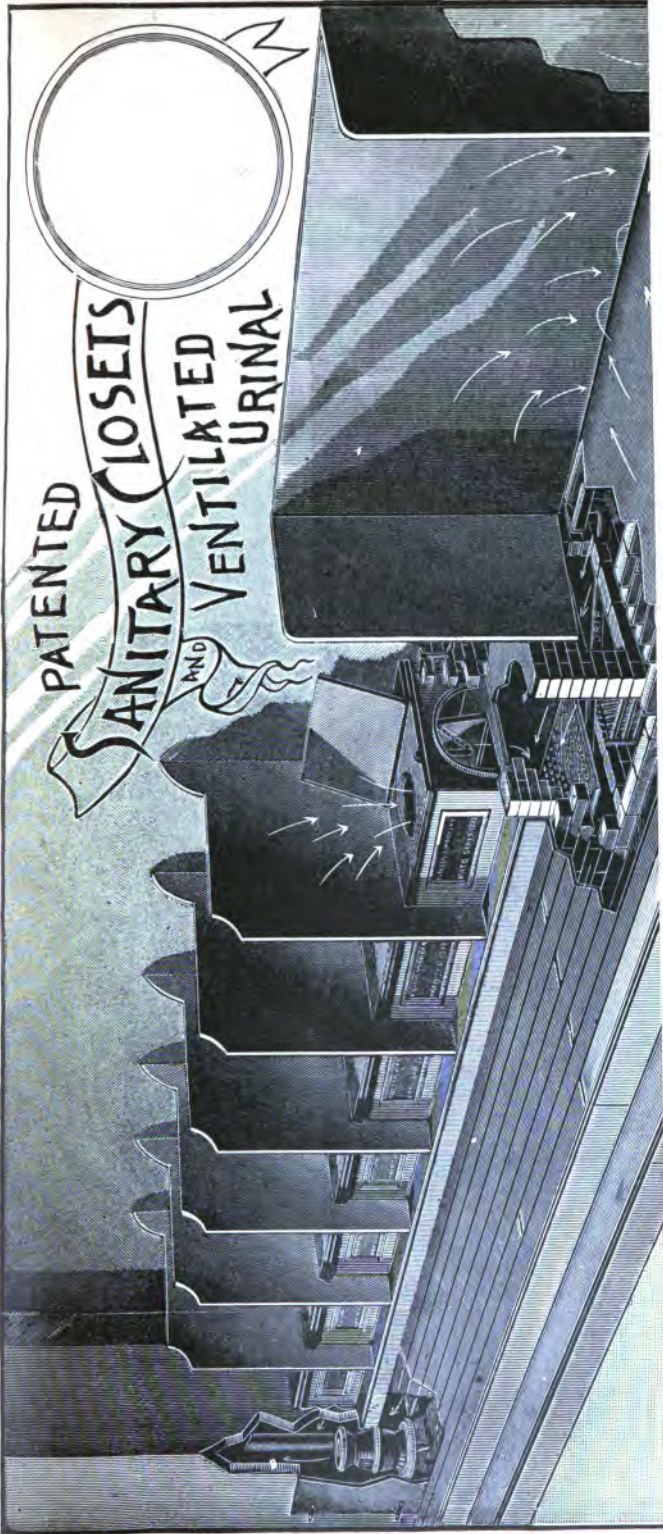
Section through dry closet vault and foul-air room, Segur Avenue school building, Toledo, Ohio. (Designed and patented by Isaac D. Sinead.)
